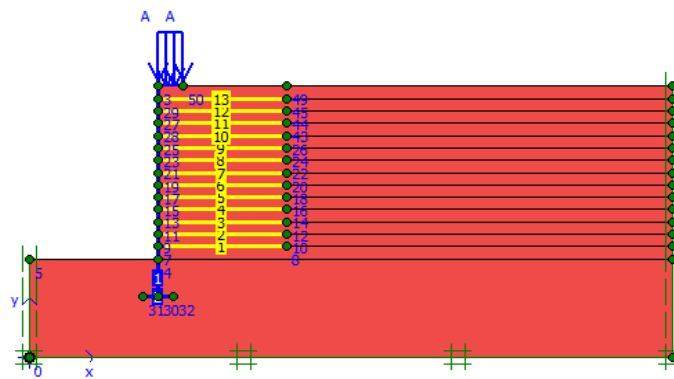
Reinforced Earth Retaining Wall with Dense Sand used as a Backfill Material
